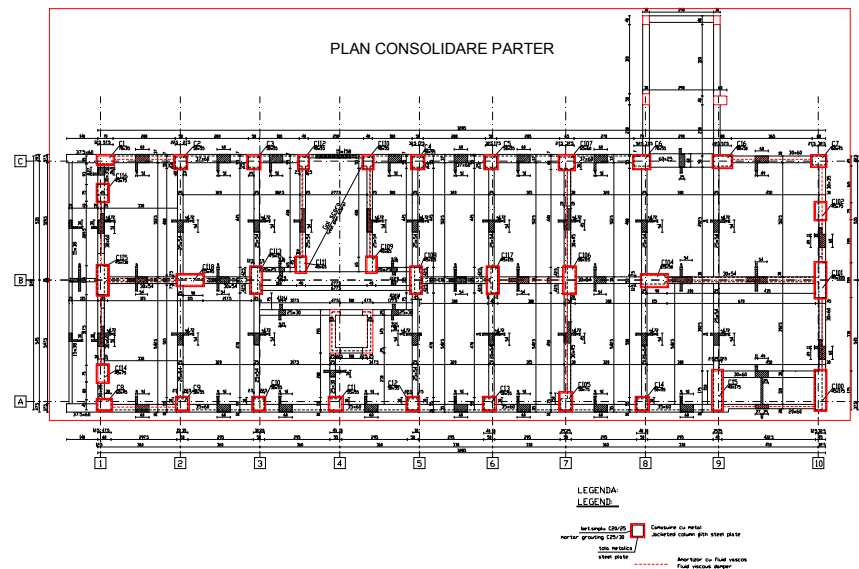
Soft and weak groundfloor RC building built in 1960's and retrofitting solution
